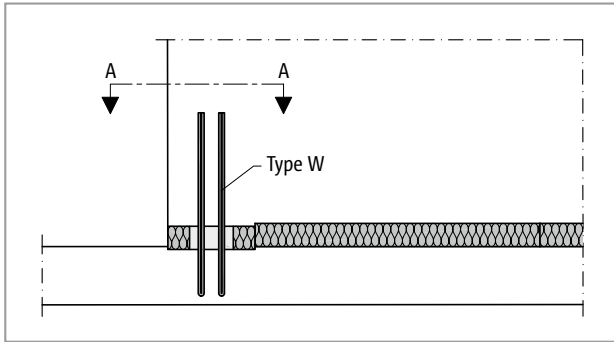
Schöck Scconnex® type W-N-VH: On-site reinforcement for connection to end of wall
